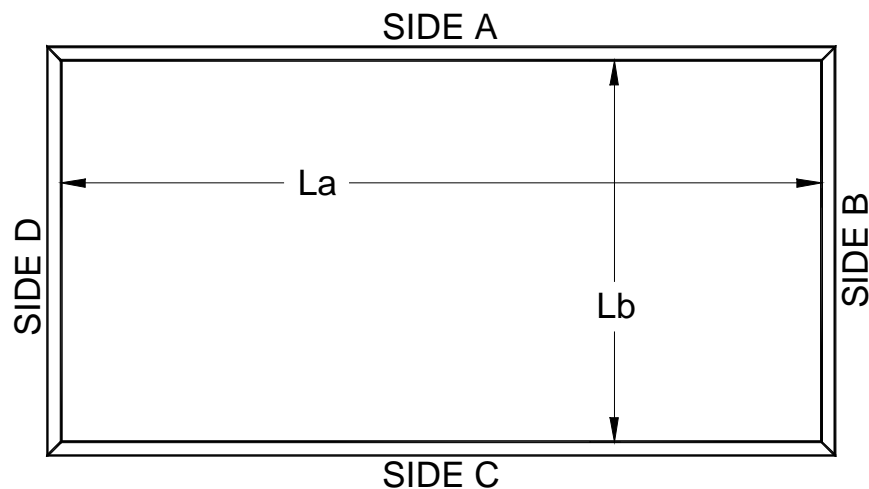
Plan View of Rectangular Sheet Metal Curb.
